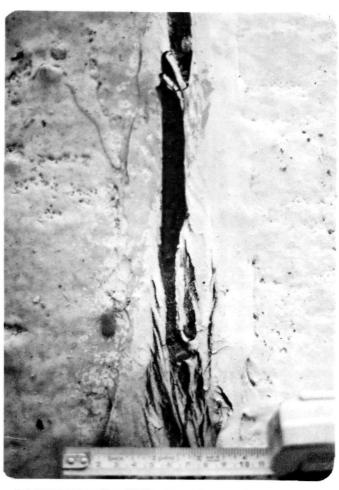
Typical joint failure originated from loss of adhesion to sulphur panel.
